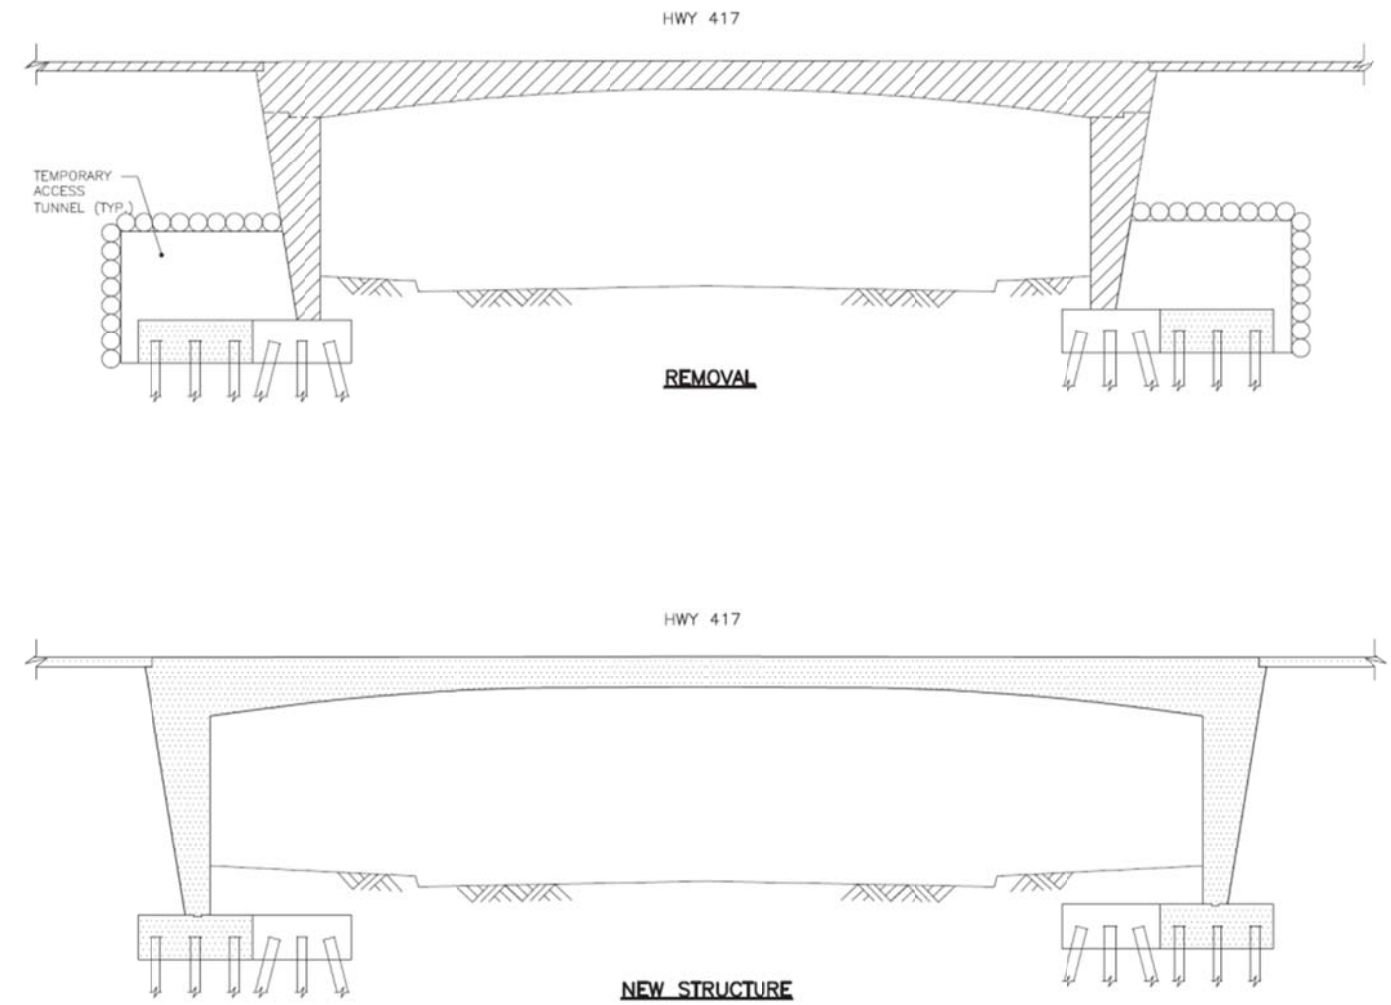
Alternative CI – Rapid Bridge Replacement Longer Span
